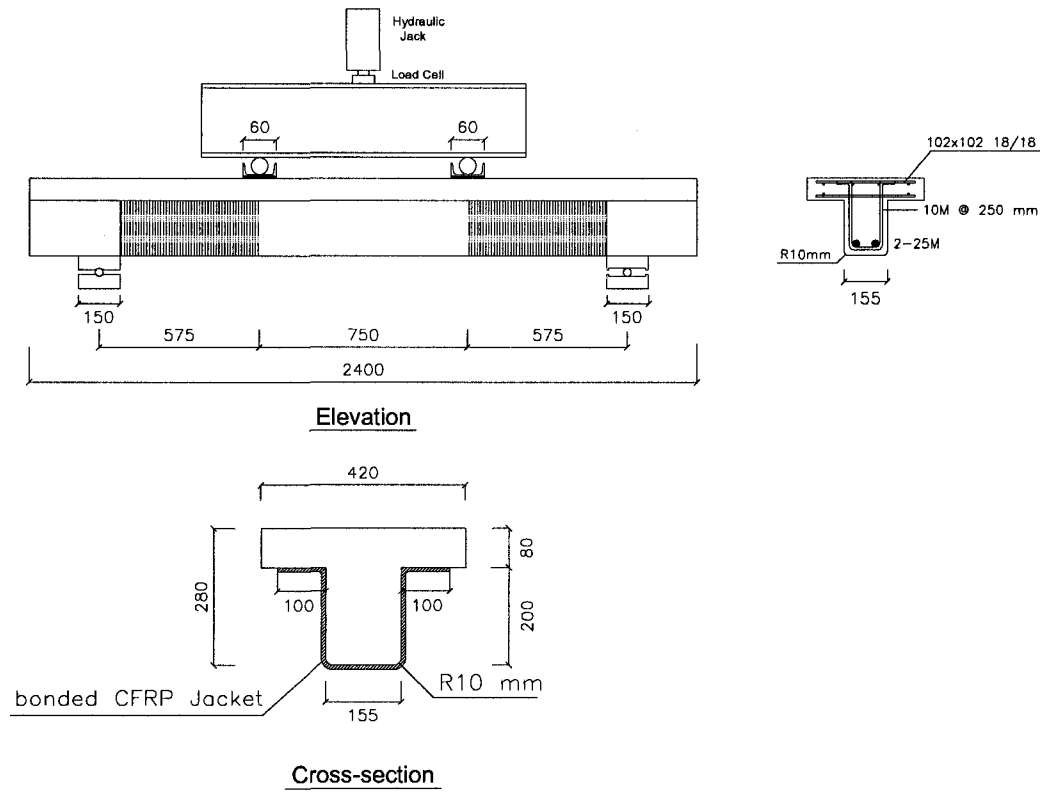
Layout of beam S-E-B strengthened with externally-bonded CFRP sheet
